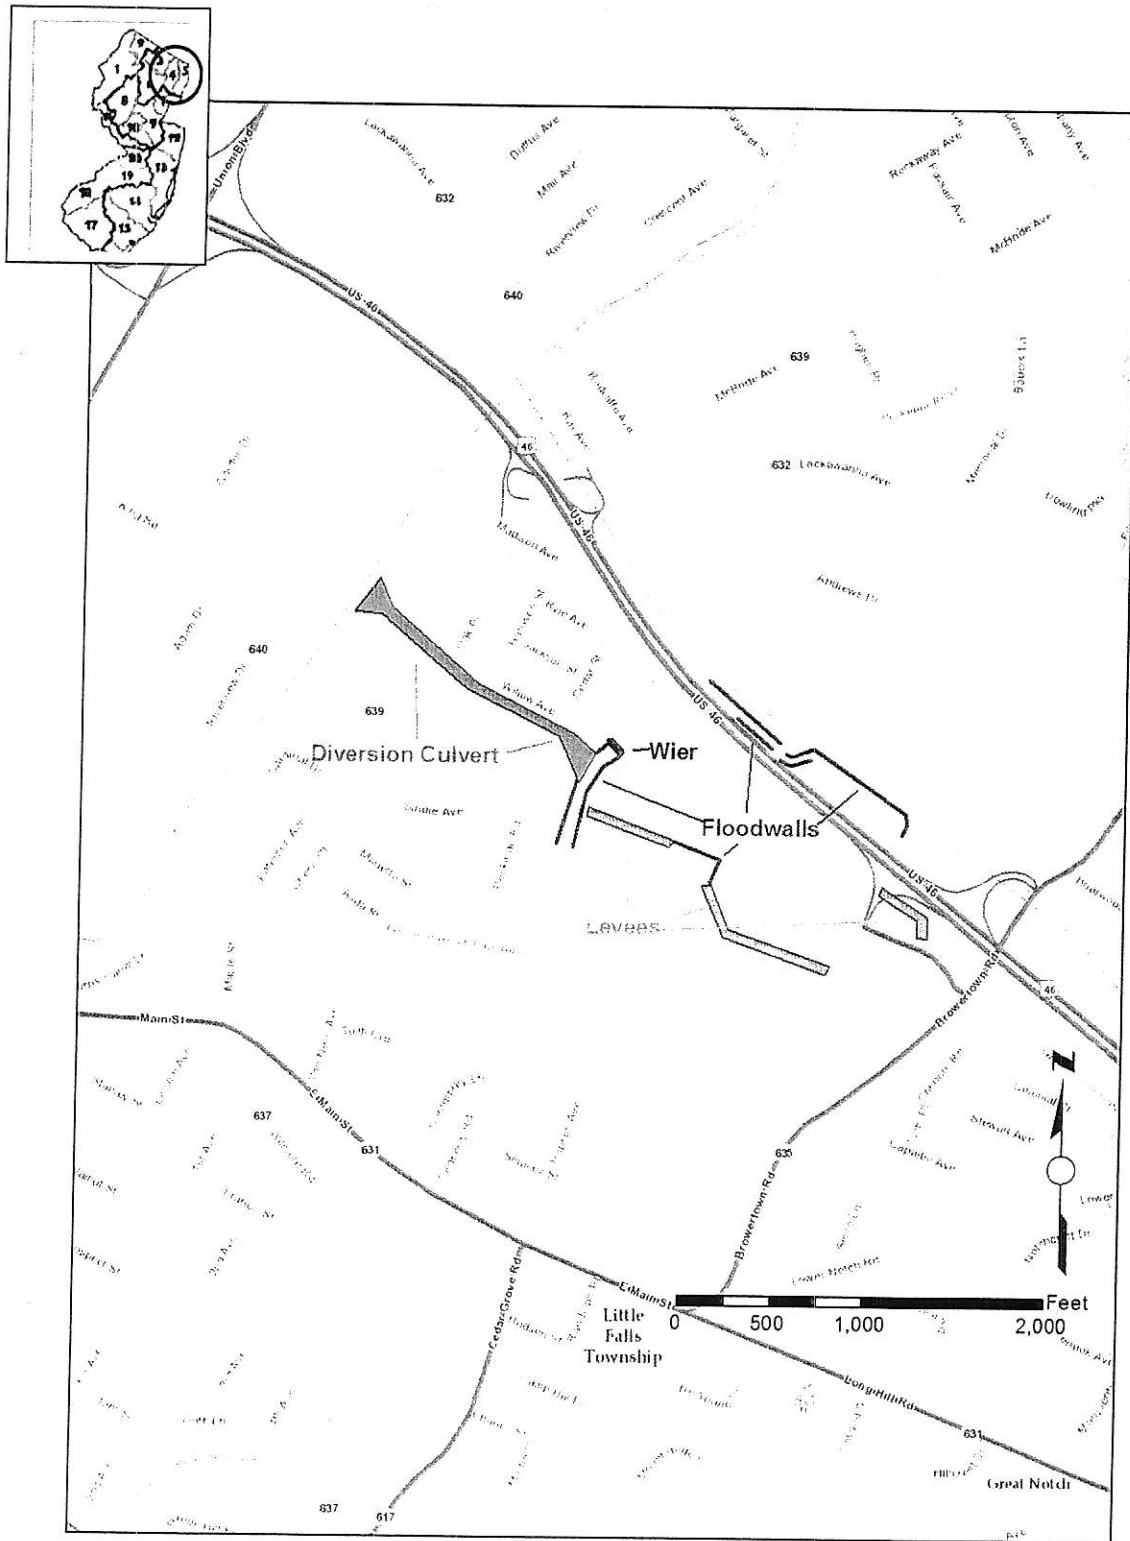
Proposed structural flood protection measures for the Peckman River and Great Notch Creek in Little Falls Township and the Borough of Woodland Park, Passaic County, NJ.
